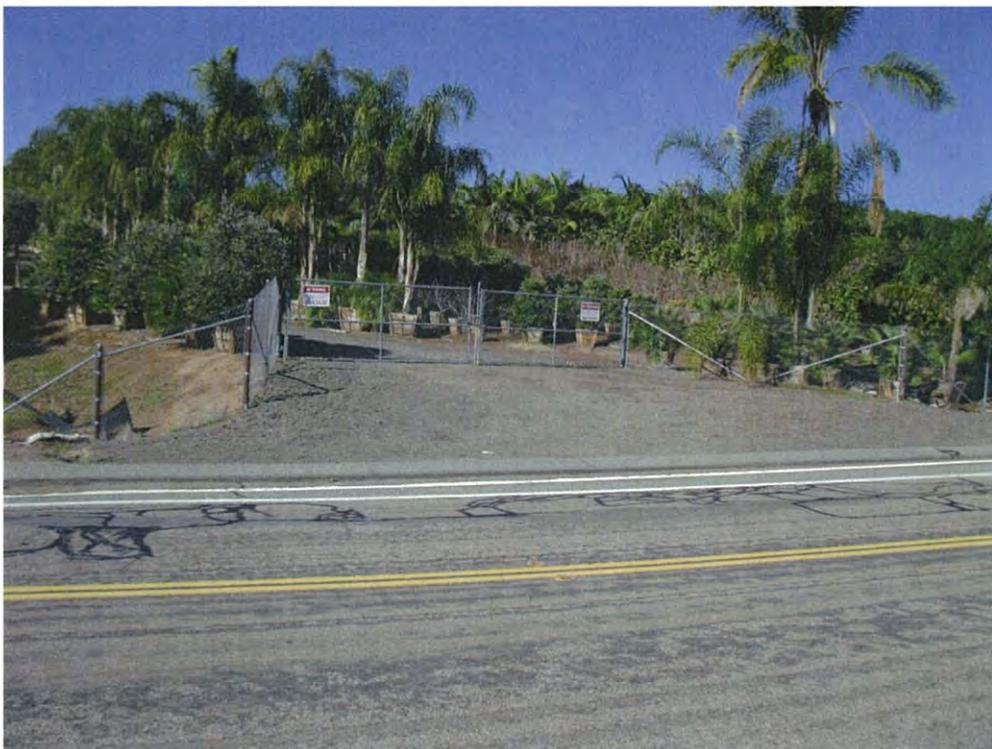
Looking towards the Project Site from Old Highway 395 at the proposed access point
